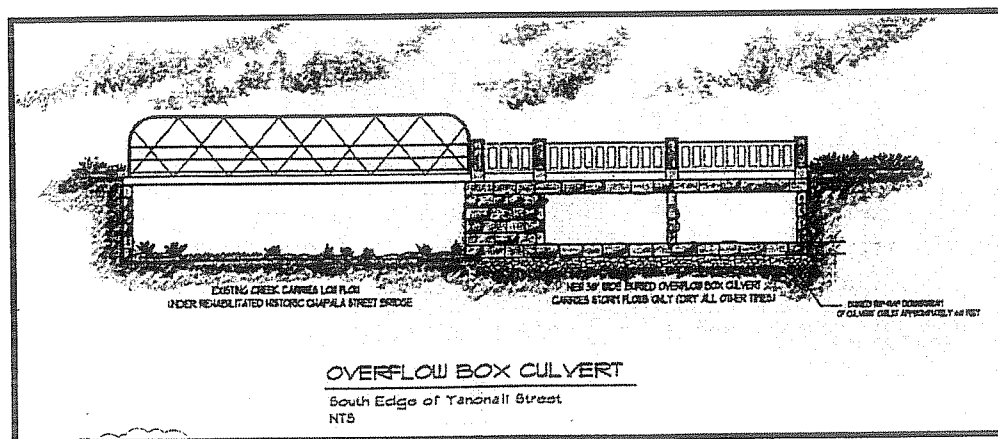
Outlet of Overflow Culvert Alongside Chapala Street Bridge
